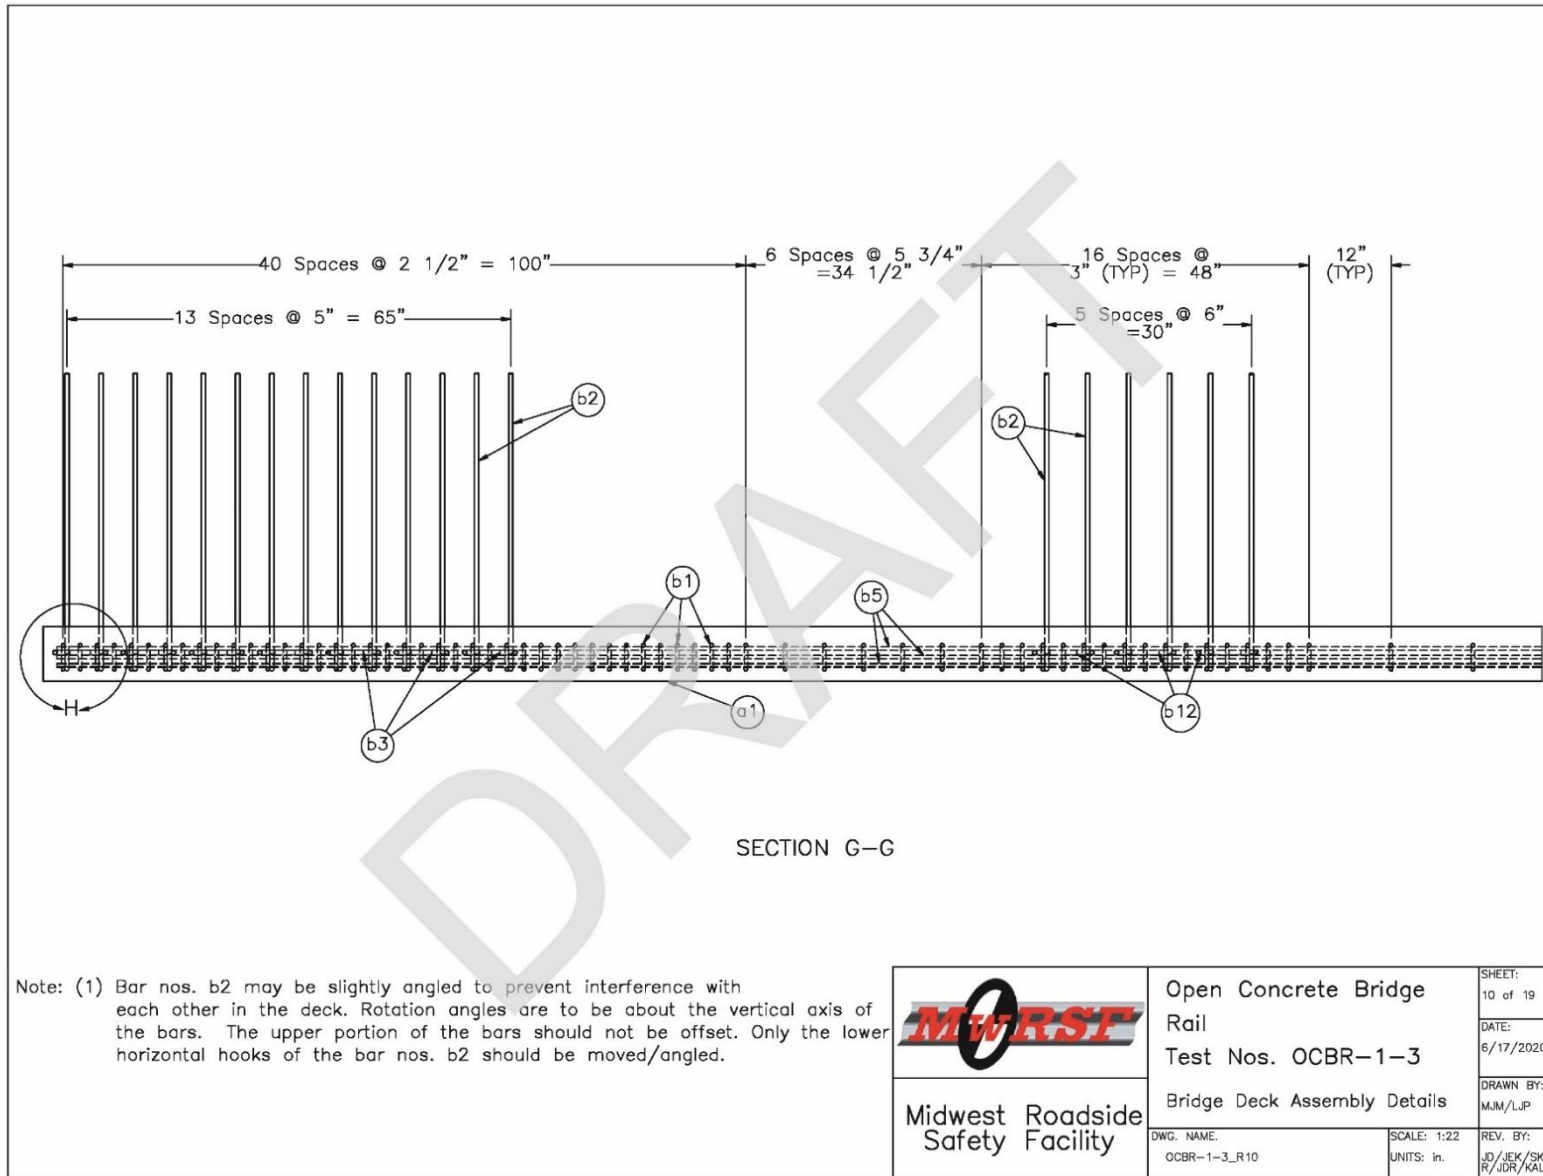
Open Concrete Bridge Rail Upstream End Section and First Interior Post Bridge Deck Assembly
